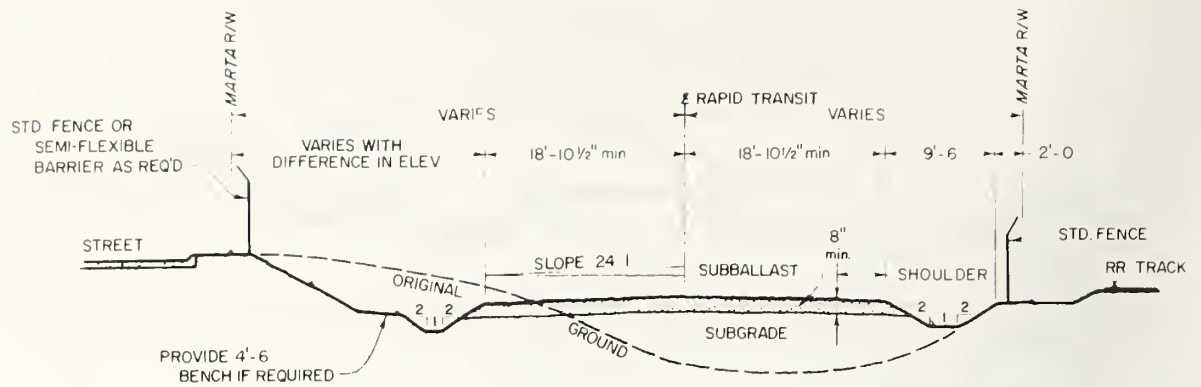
TYPICAL AT-GRADE SECTION [10-6]
